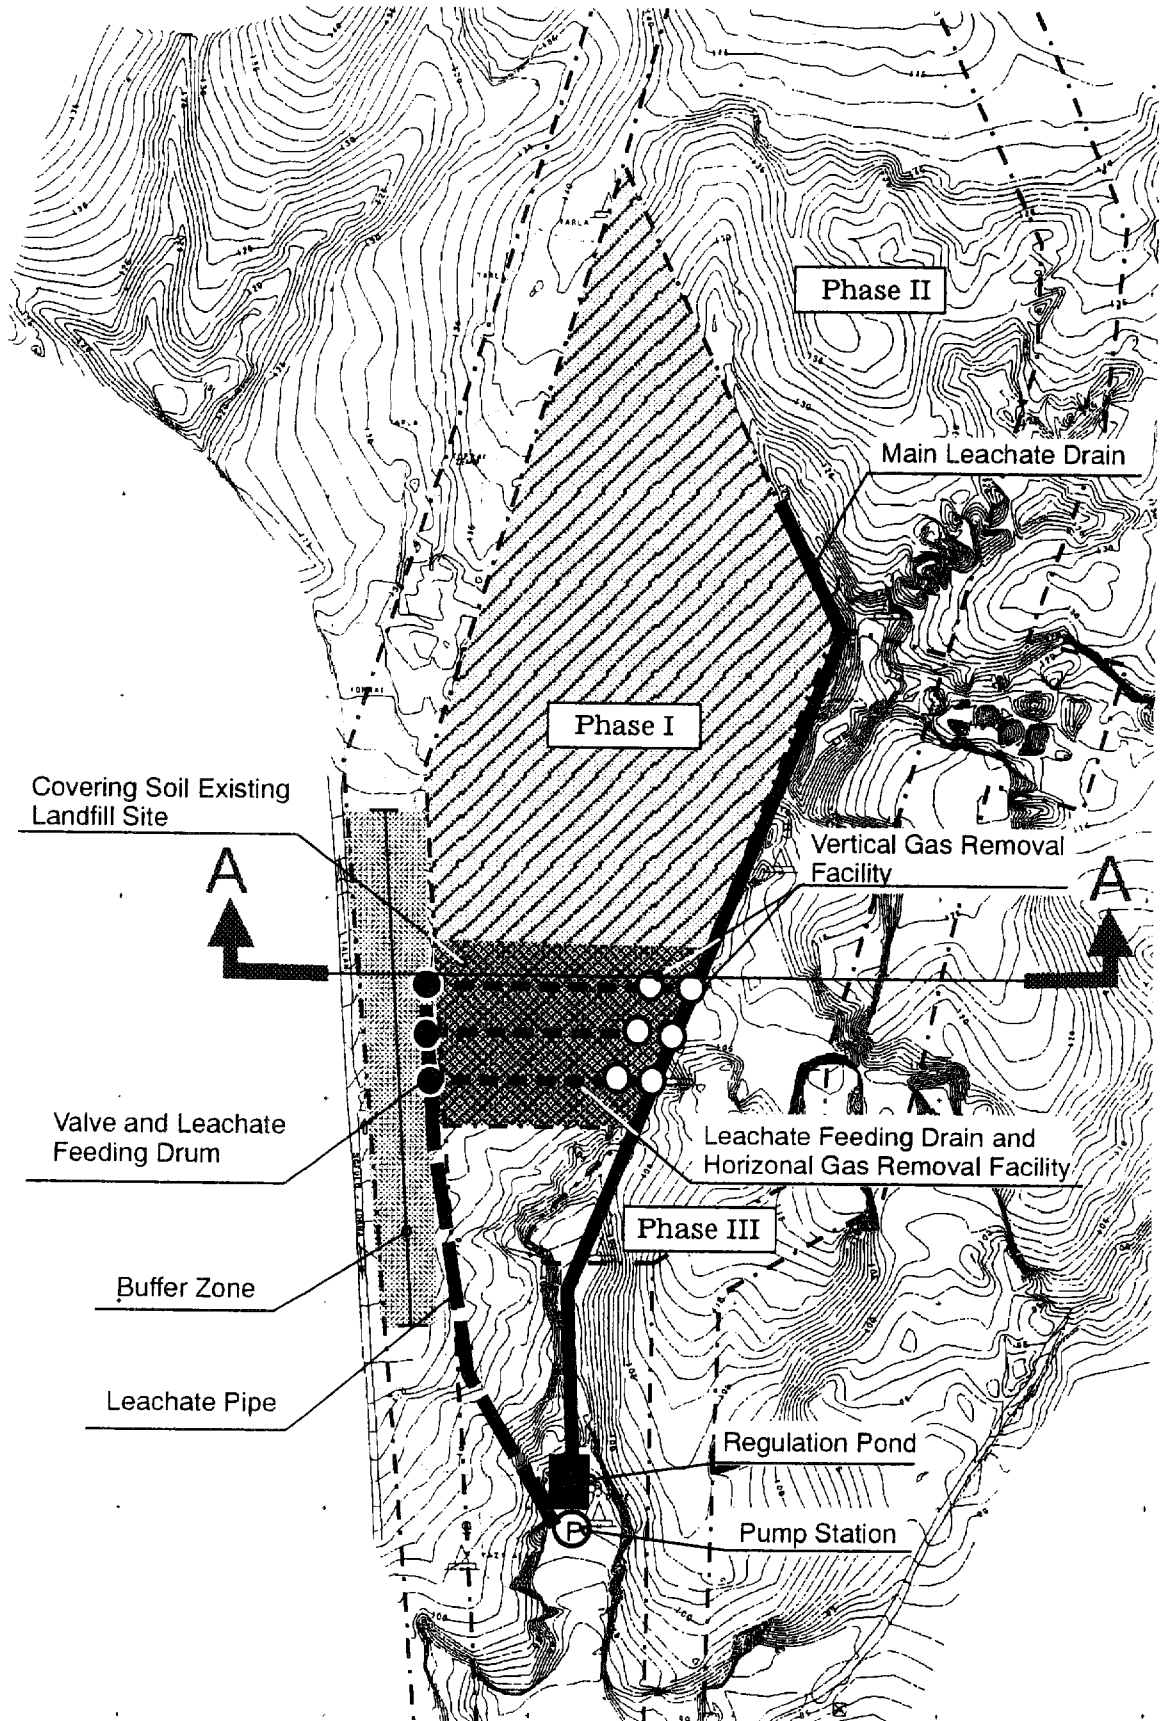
Overall Plan of the Experiment on the Improvement of Sofulu Disposal Site
